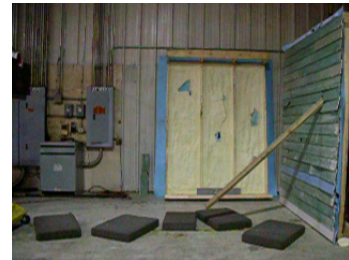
Wall 1 (Insulating Sheathing + Housewrap) pass at 30 fps
